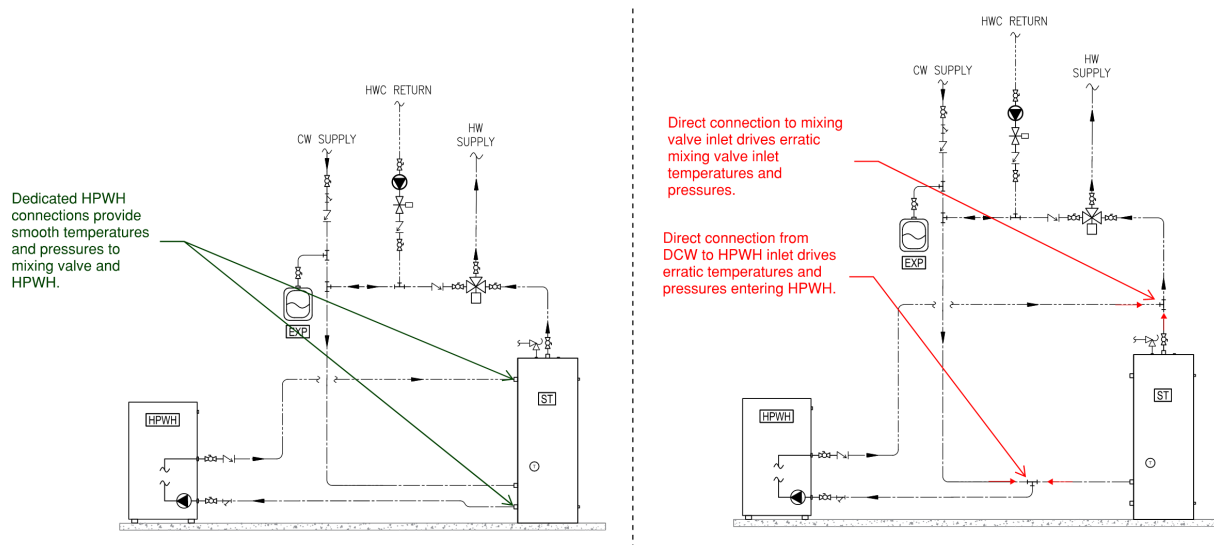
Left (correct): Dedicated tank connections for HPWH inlet and outlet provide hydraulic separation. Right (incorrect): HPWH inlet and outlet are piped to mixing valve inlet and DCW make up, driving erratic HPWH and mixing valve behavior.
